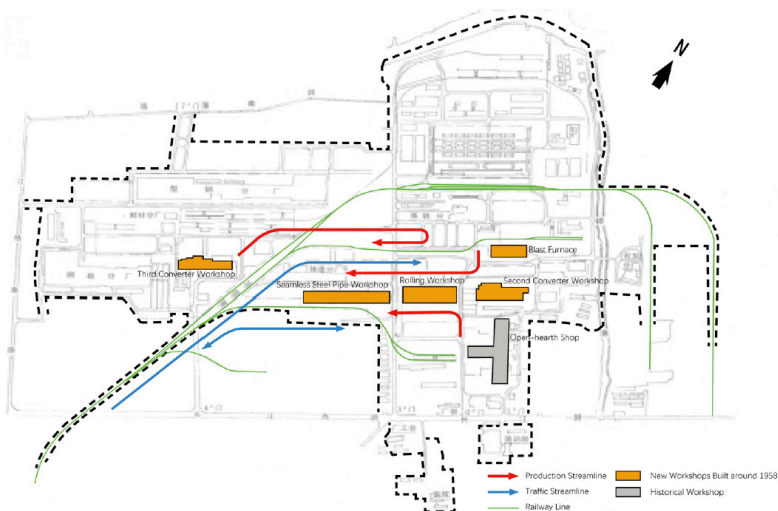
Site plan of the Shanghai No.1 Iron and Steel Works
